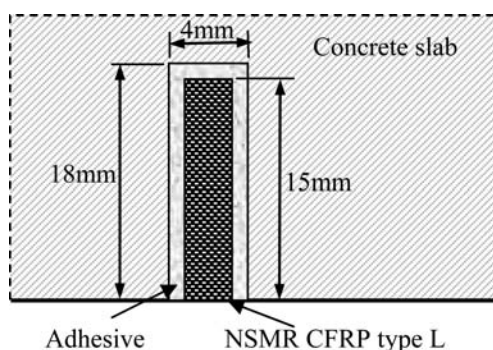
The strengthening of floor slabs toward “x” with inserted tapes CFRP.
